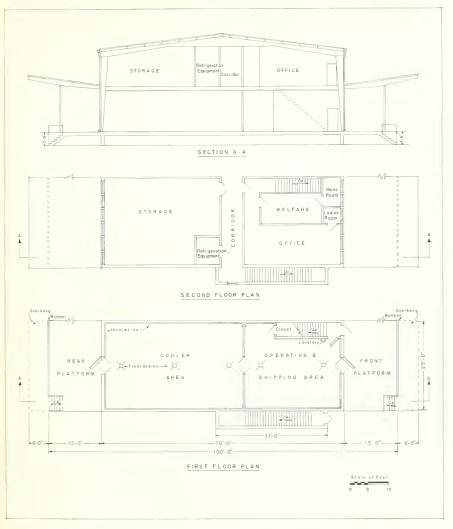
Possible layout for a 25-foot unit in the proposed market for handling meat and meat products in San Juan. P.R.
